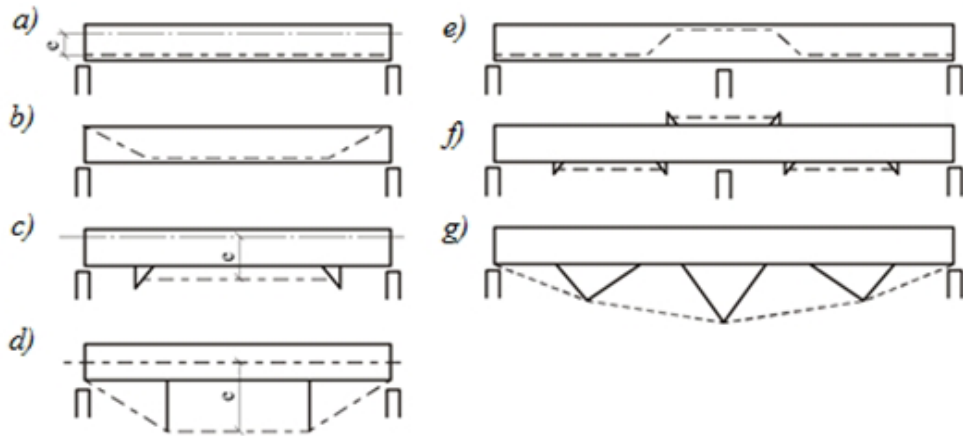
Beams with prestressed tie pieces and strut-framed beams
